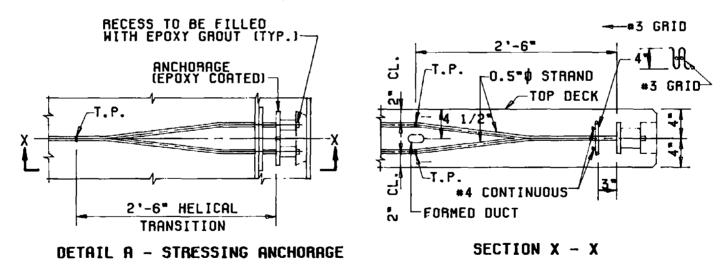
Typical lightweight-concrete deck panel, Woodrow Wilson Memorial Bridge.
